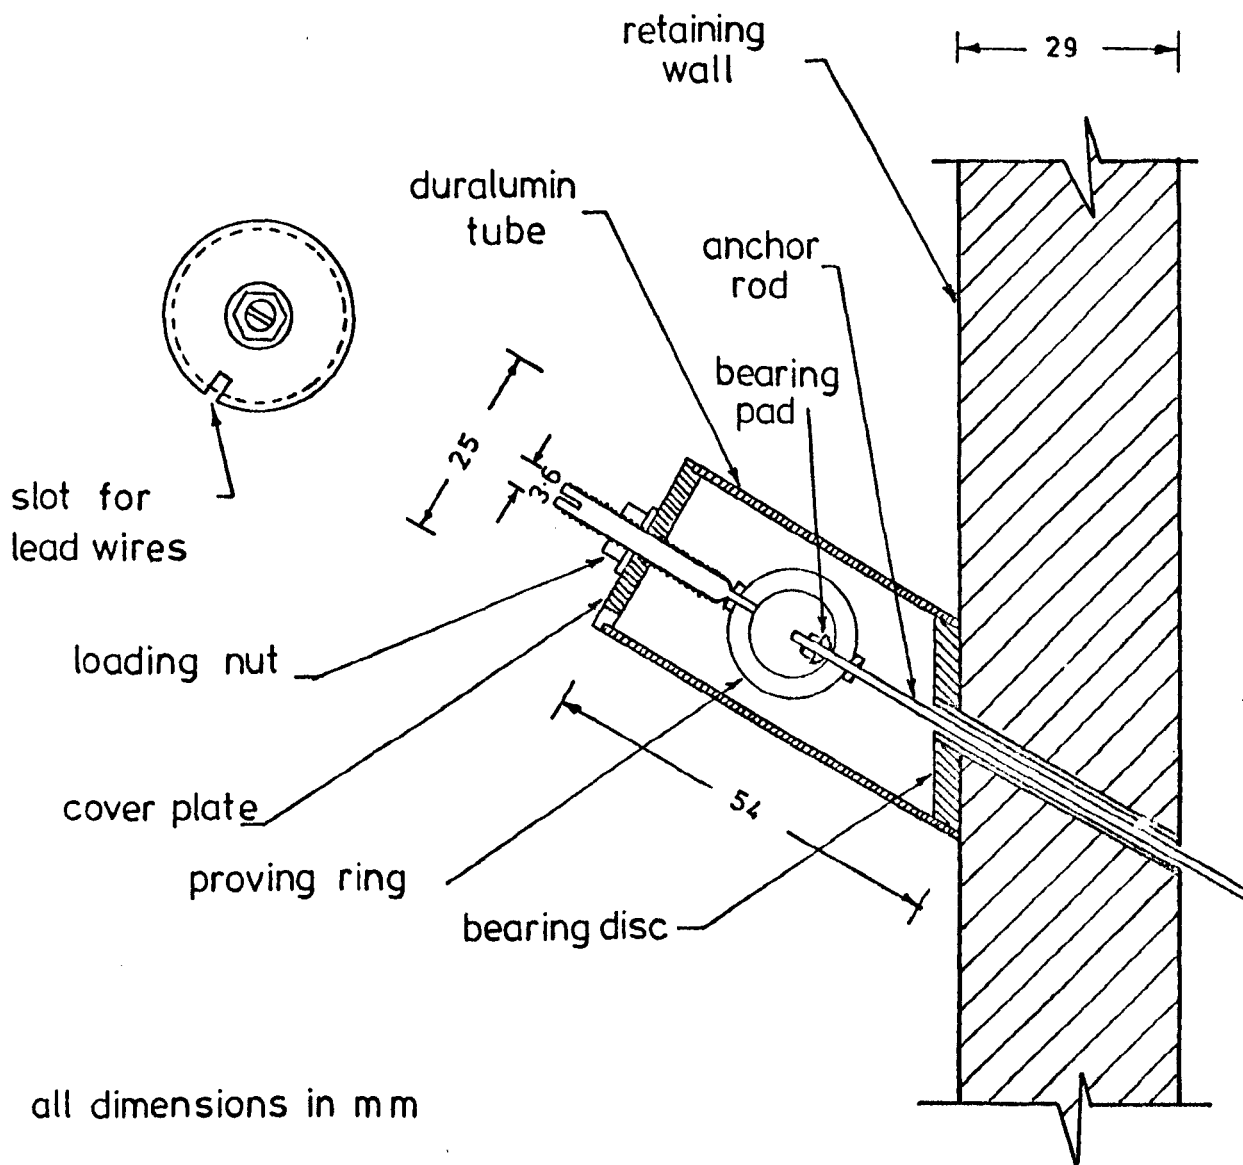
LOAD TRANSDUCER ARRANGEMENT
